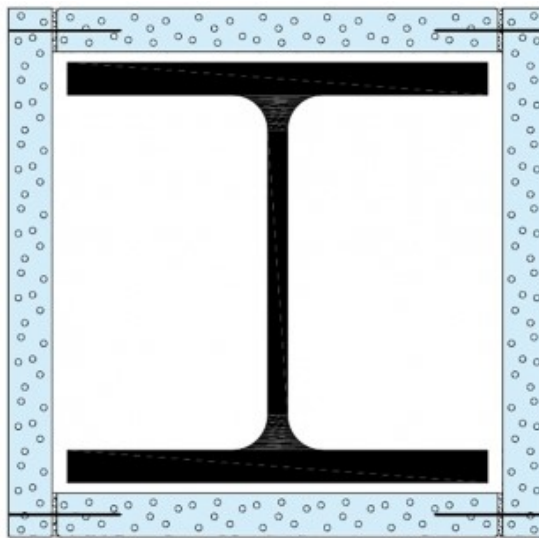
Steel cross-section covered with a layer of Knauf Fireboard fire-resistant cladding.
